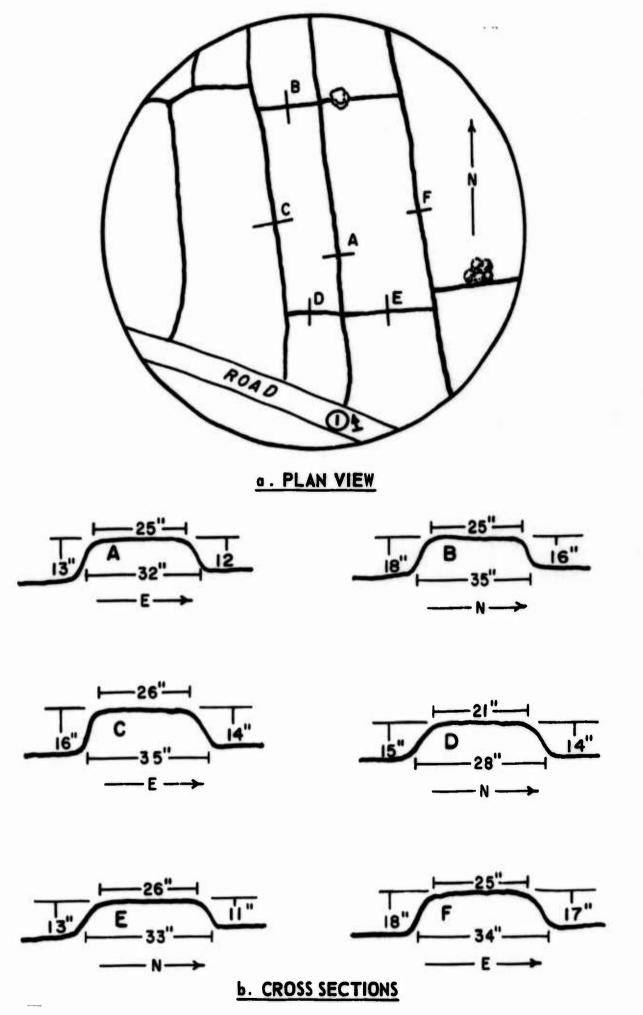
Terraced paddies--dike plan view and cross sections at site SG-115 (September 1964)
